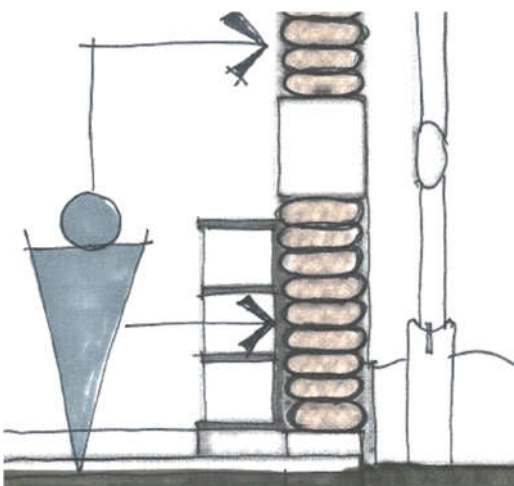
Cross Section showing sandbag wall (Source: Author 2023)
